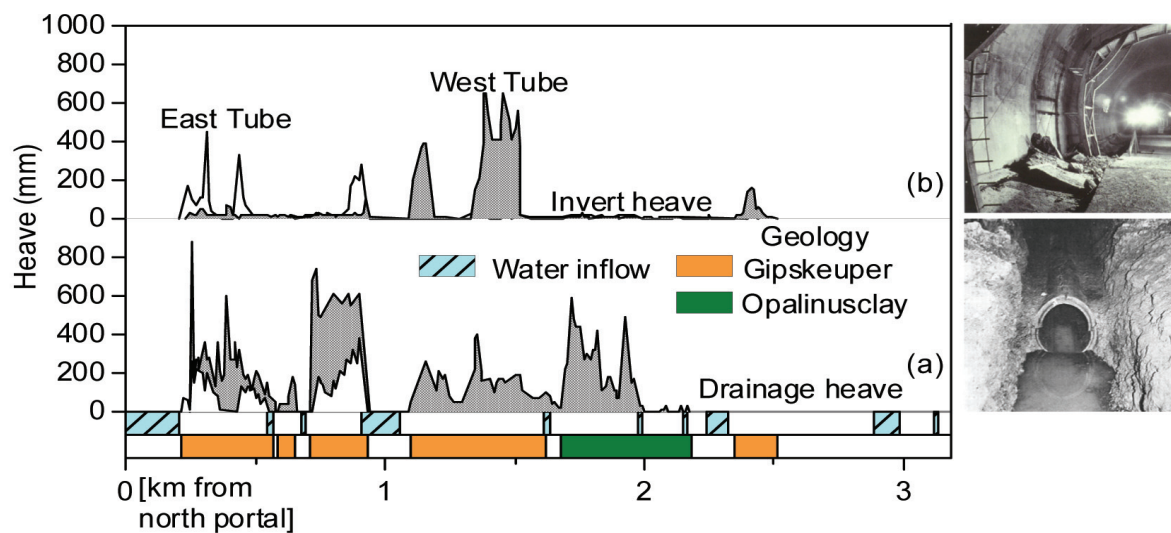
Belchen tunnel (1963-1970): (a) heave and failure of the drainage pipe before construction of the invert, (b) heave and failure of the original invert during construction (original Figures by Grob, 1972, 1976; modified after Amstad and Kovári, 2001).
